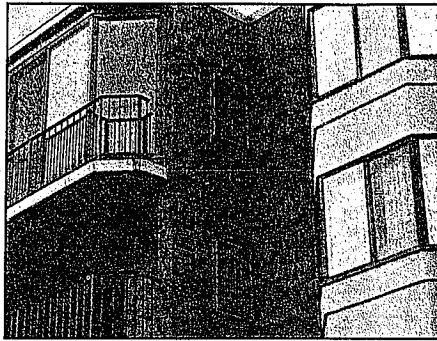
Sound-deflector facade grille to deflect sound away from protruding bay window in close proximity to Magic-Pak outdoor side.
